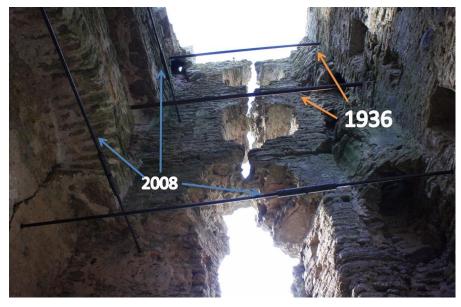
Steel anchors mounted into the SW tower to stabilize the wall movement
